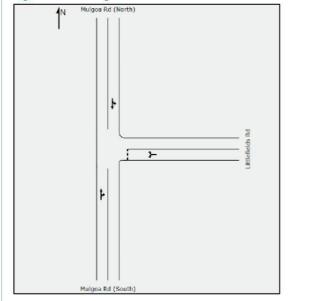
Mulgoa Road/Littlefields Road Intersection Layout
